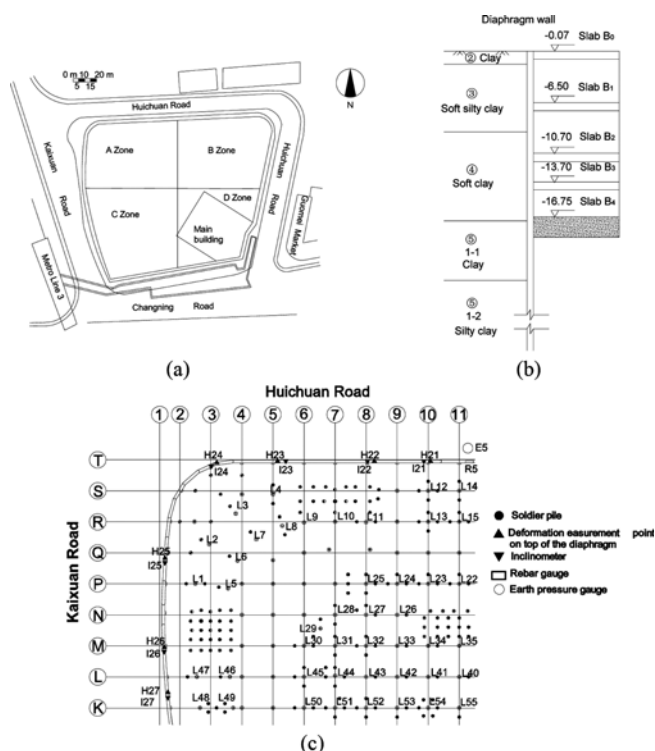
Site Plan, Section Through Bracing System, and Layout of Bracing System and Instruments: (a) Site Plan, (b) Section Through Bracing System in Zone A, (c) Layout of Bracing System and Instruments in Zone A
